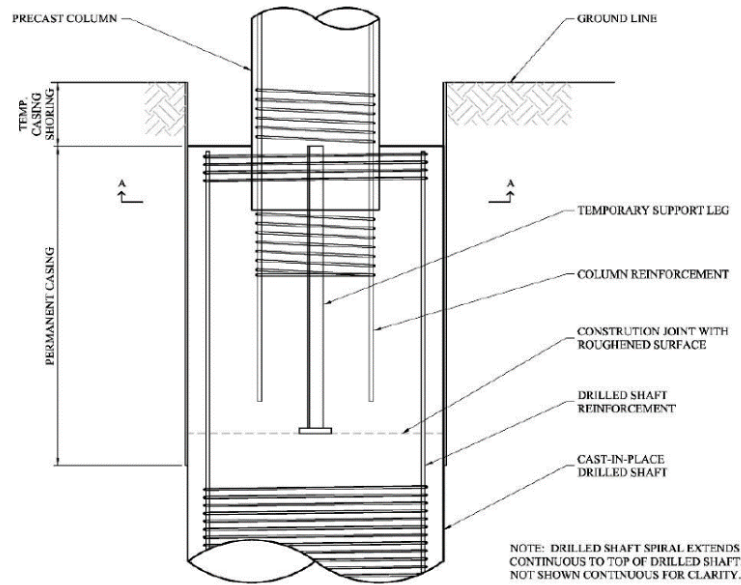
Footing-to-column connection proposed by Hieber et al. (2005)
